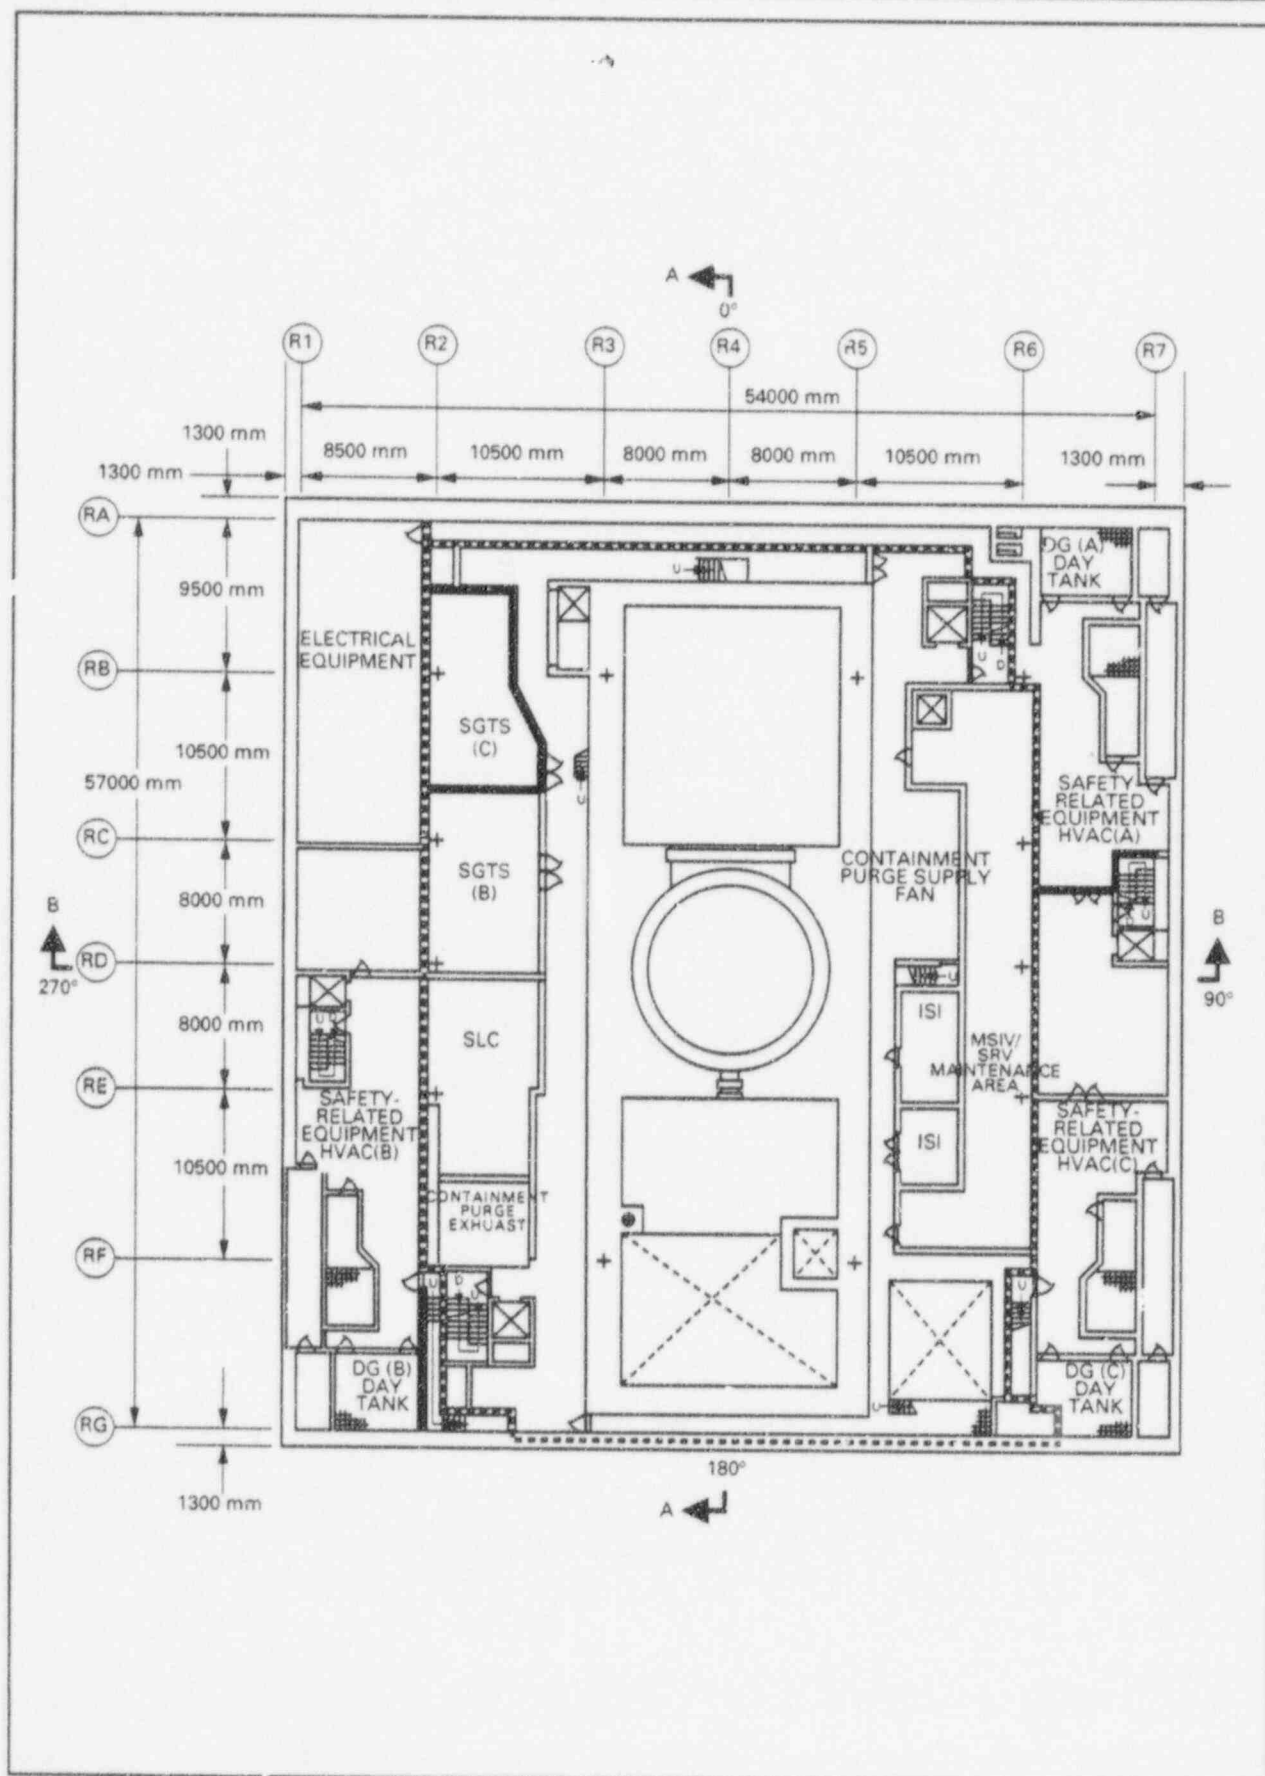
I Reactor Building Arrangement, Floor 3F—Elevation 23500 mm
